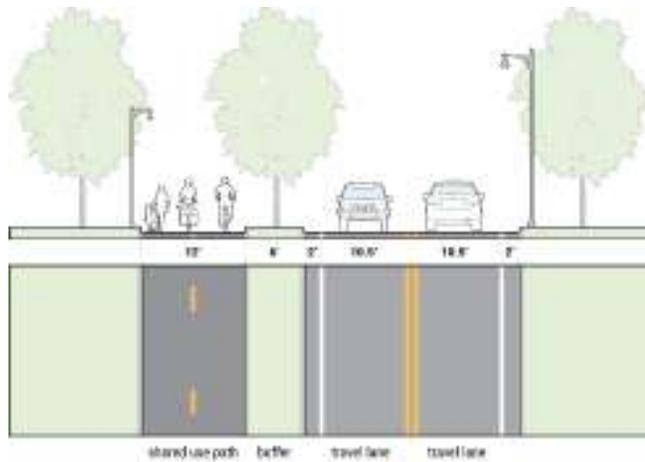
Hammond Pond Parkway Segment 1A Long-term Typical Cross Section
